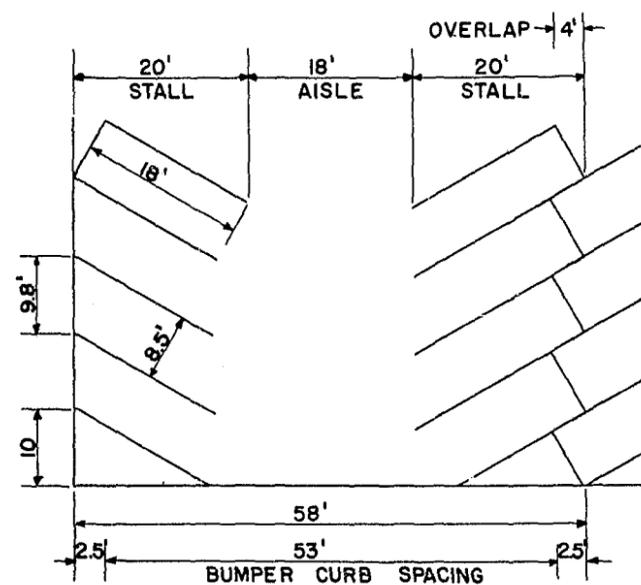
Minimum dimensions for parking area layout, 60° stalls.
